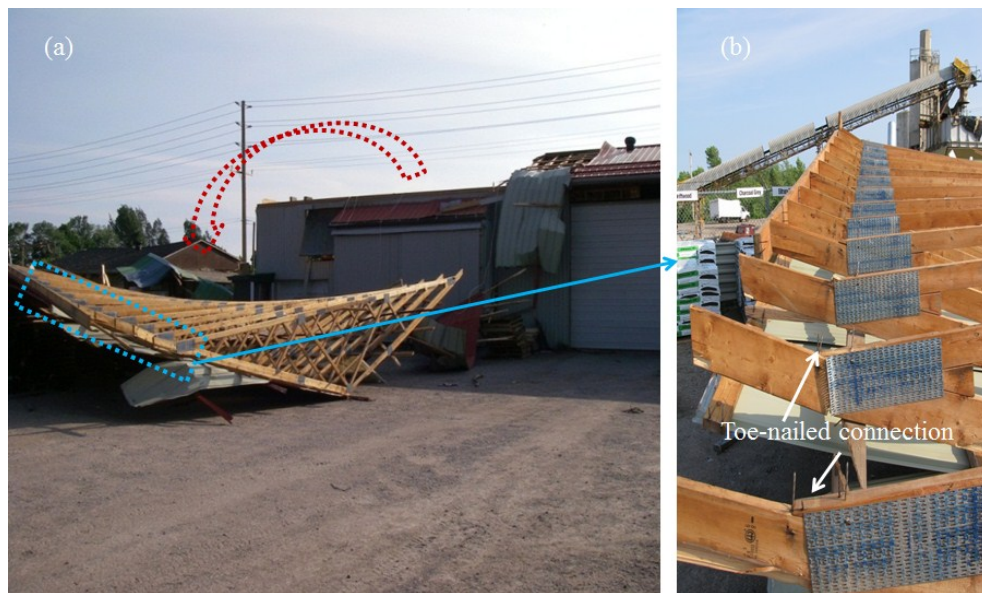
Failure of a group of trusses during a tornado (June 23, 2010; Midland, Ontario; photo courtesy of M.J. Morrison).
